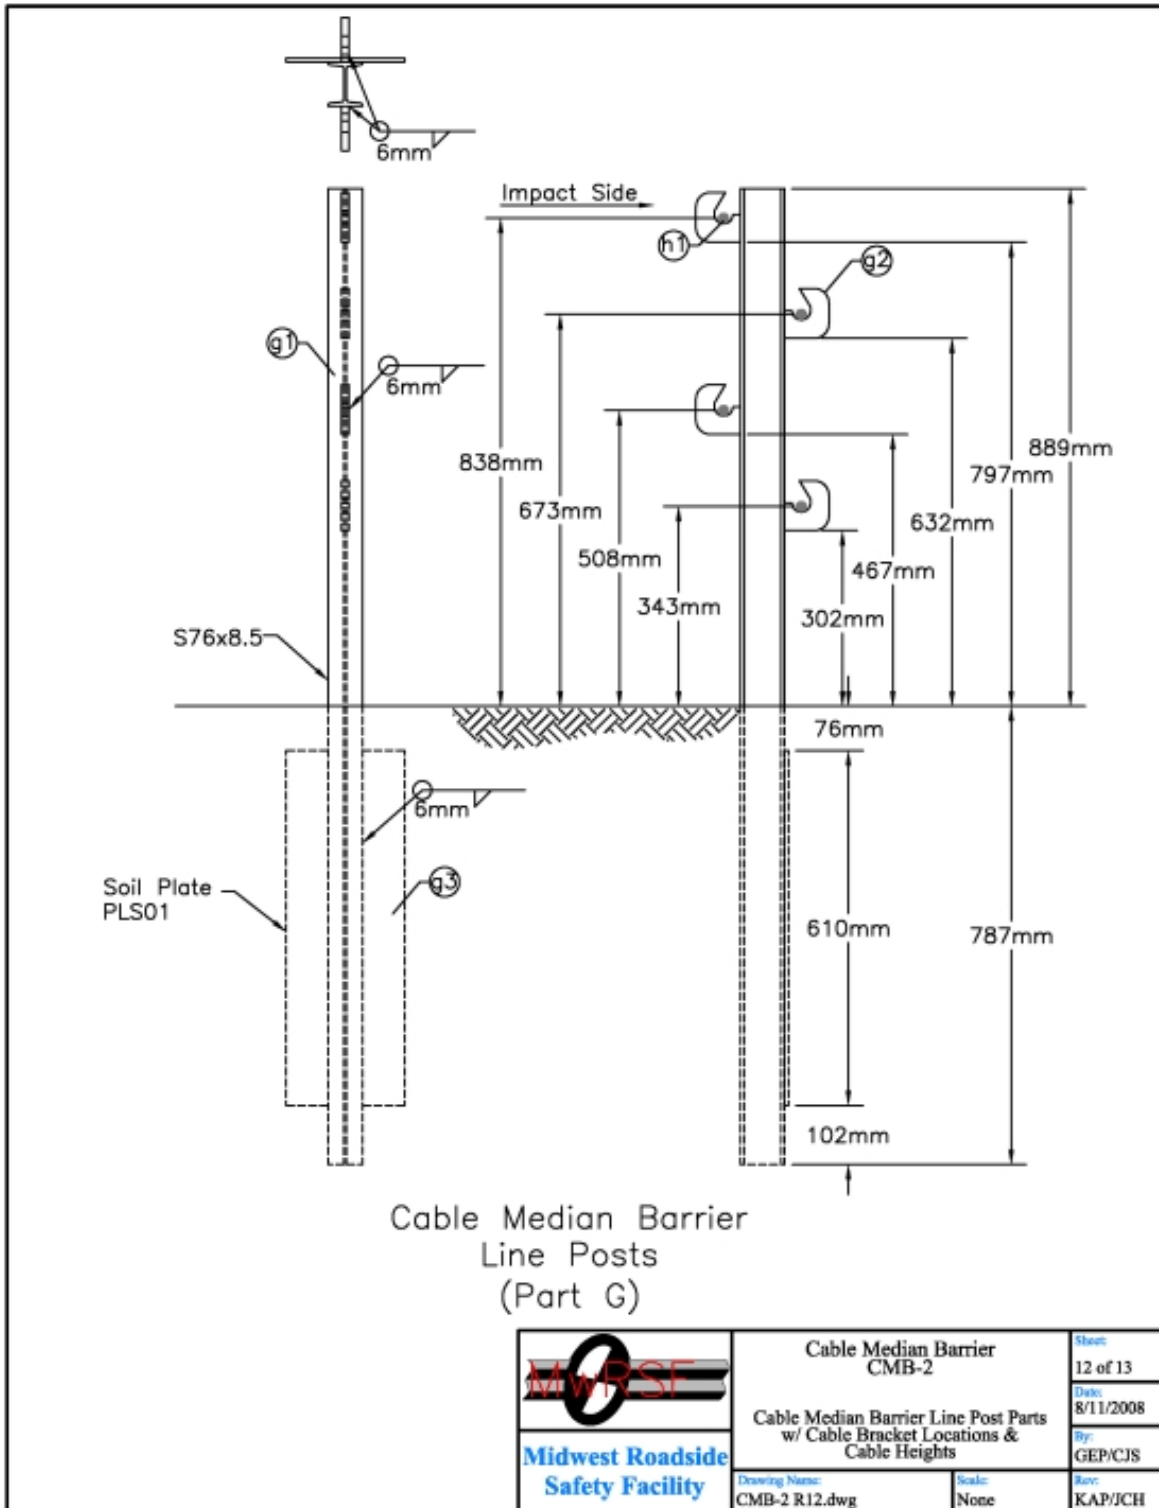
Bracket Locations and Cable Heights (Metric), Design No. 2
